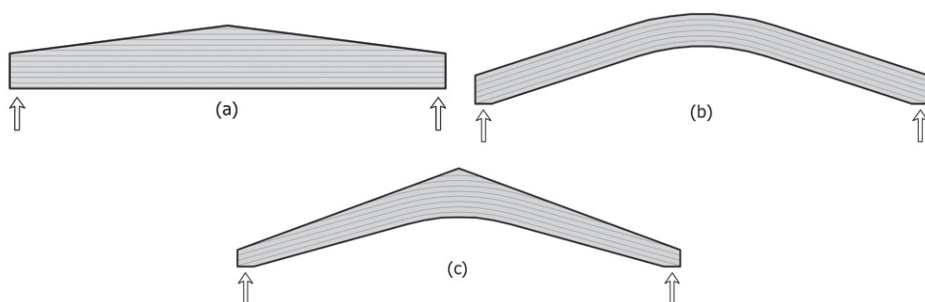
Typical glued laminated beams: (a) double-tapered beam; (b) curved beam and (c) pitched cambered beam
